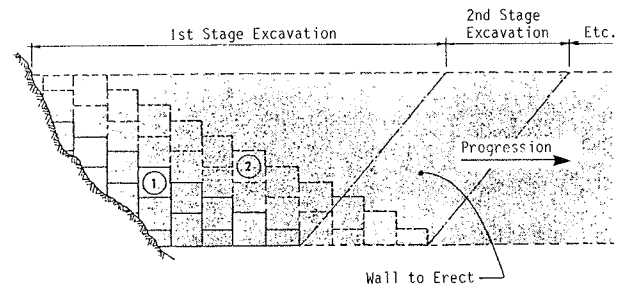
Phased construction of a Reinforced Earth wall on an unstable slope.
